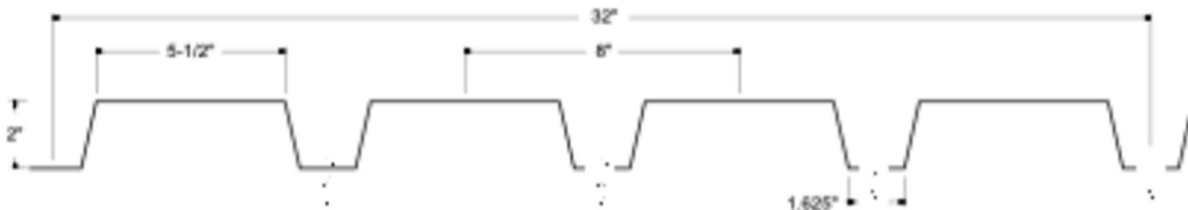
13 TMP LITE WALL 2-8-32 PANELS (4 SCREWS)
